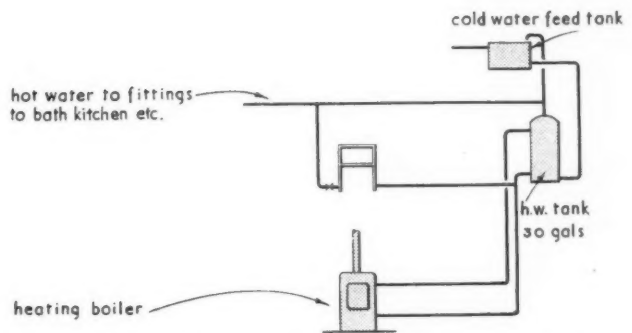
Pipe layout for a hot water supply and bathroom towel rail only.
